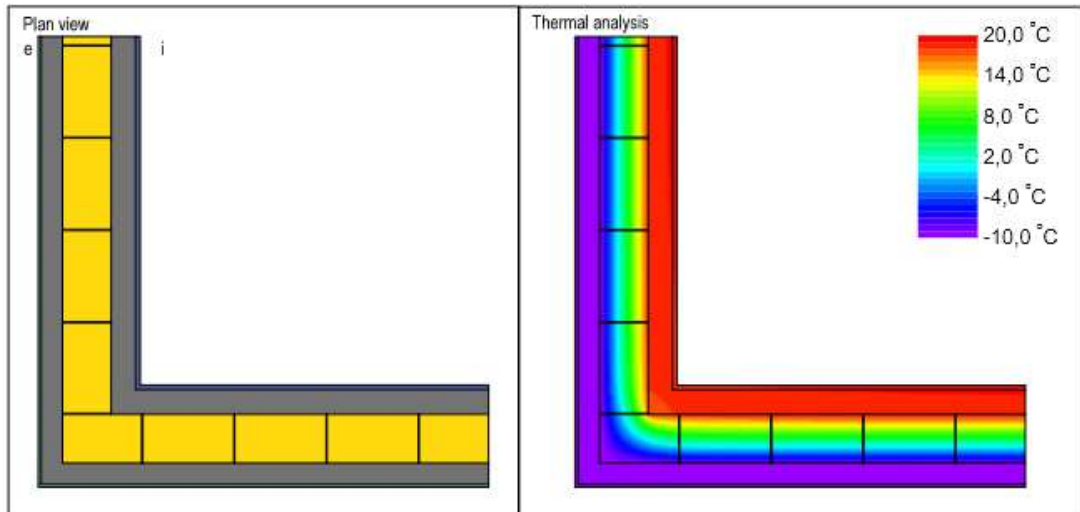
Brick masonry lay-up. Structure source: Pech and Kolbitsch, 23
